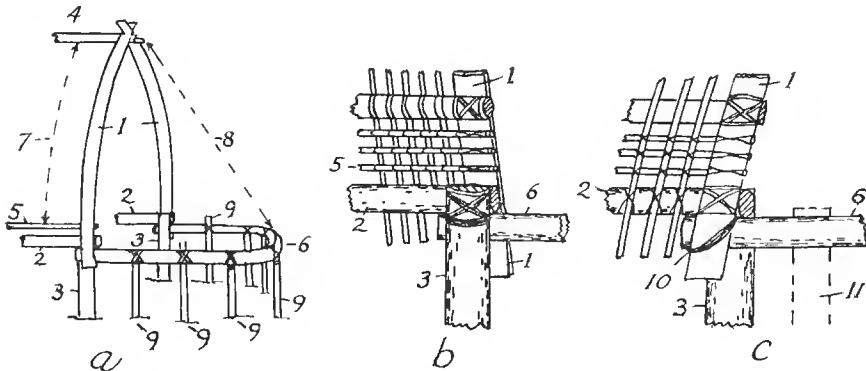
Erecting the curb plate: 1, end rafters of middle section; 2, wall plate; 3, end wall posts of middle section; 4, ridgepole; 5, small intermediate purlin immediately
